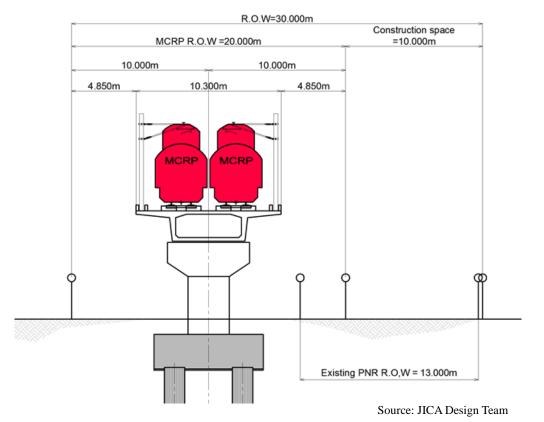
Typical Cross Section between San Fernando and Clark
